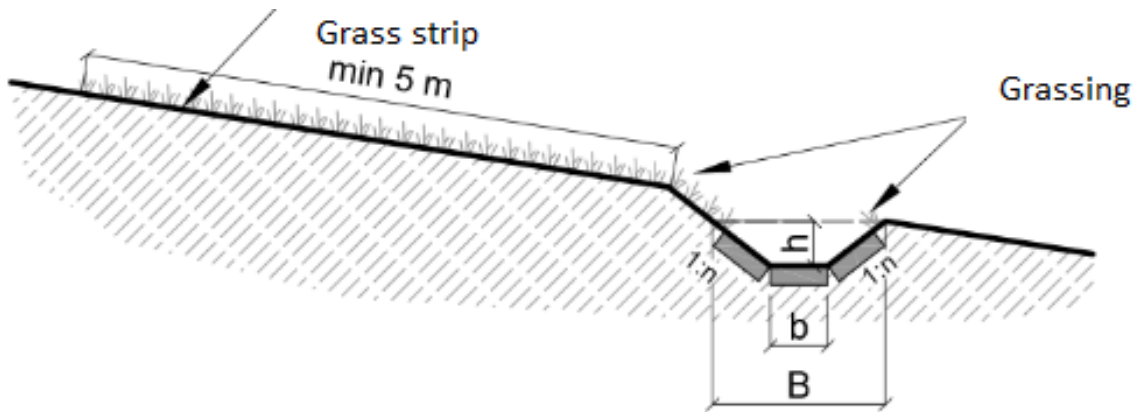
Transverse profile of drainage ditch with concrete blocks and grassing.
